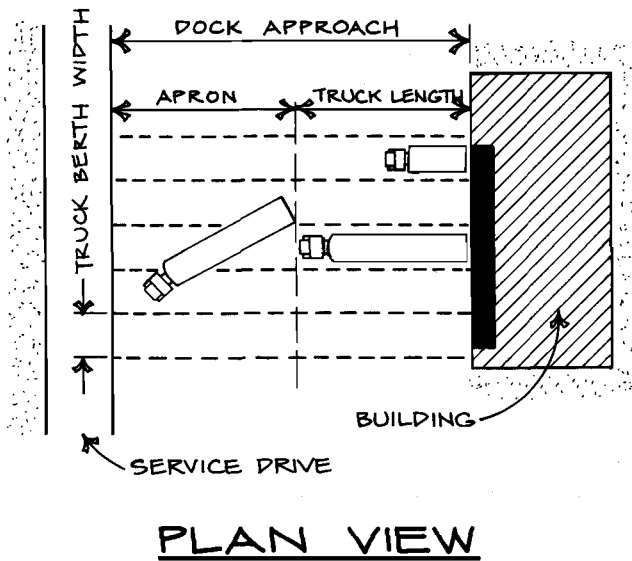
DETAILED SITE PLANNING FOR AN INDUSTRIAL PARK LOT
